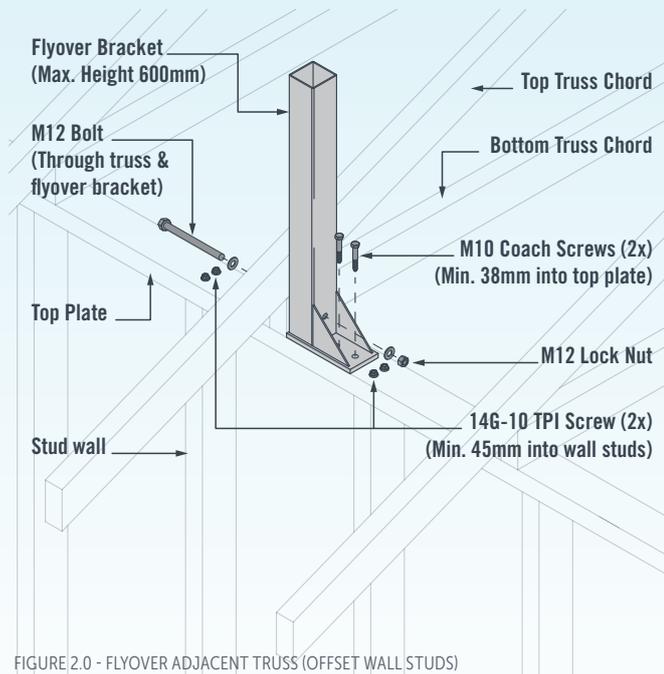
FLYOVER ADJACENT TRUSS (OFFSET WALL STUDS)
